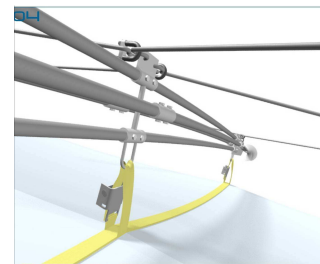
Pin joints serve as a support for the two bracing systems: tensile cables supported with a plaque, and fasten buckles for the PVC membrane
